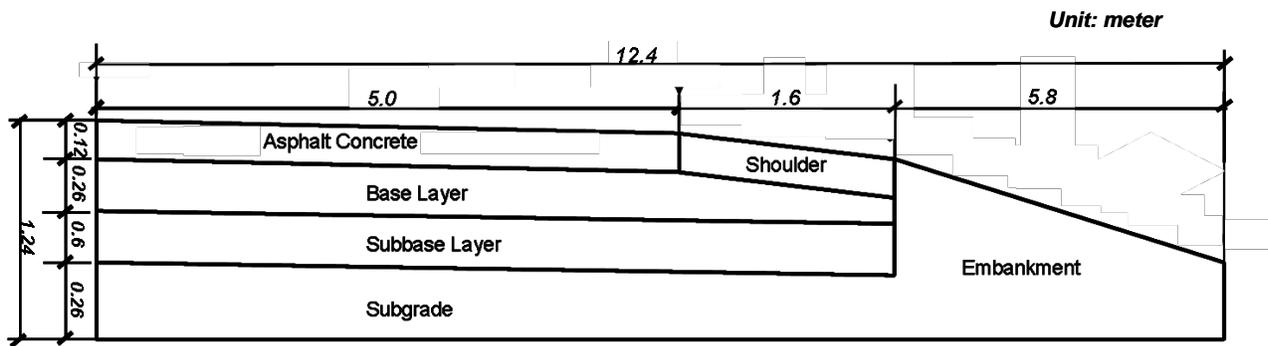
Model cross-section of State Highway 60 (not to scale, all dimensions in meters).
